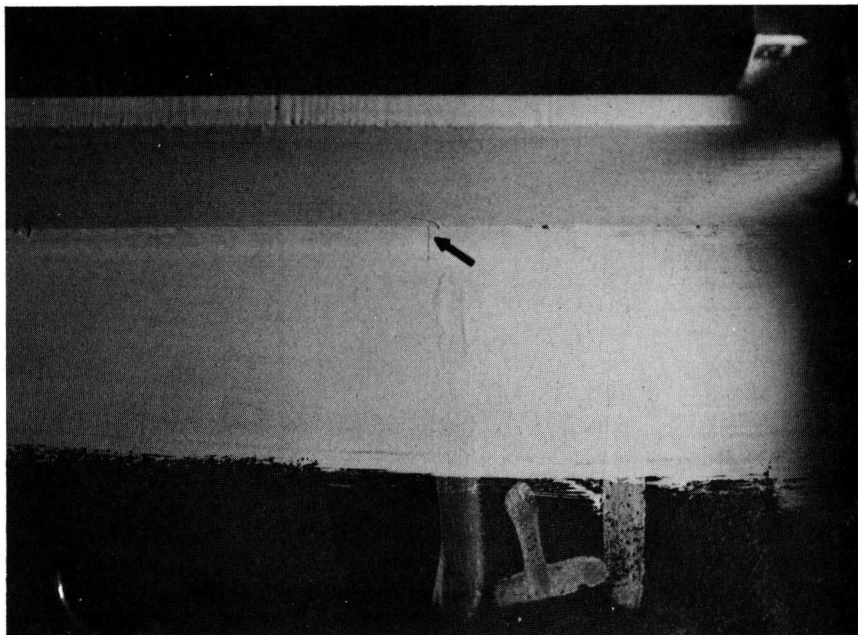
Hairline crack in longitudinal fillet weld at a tack weld.
